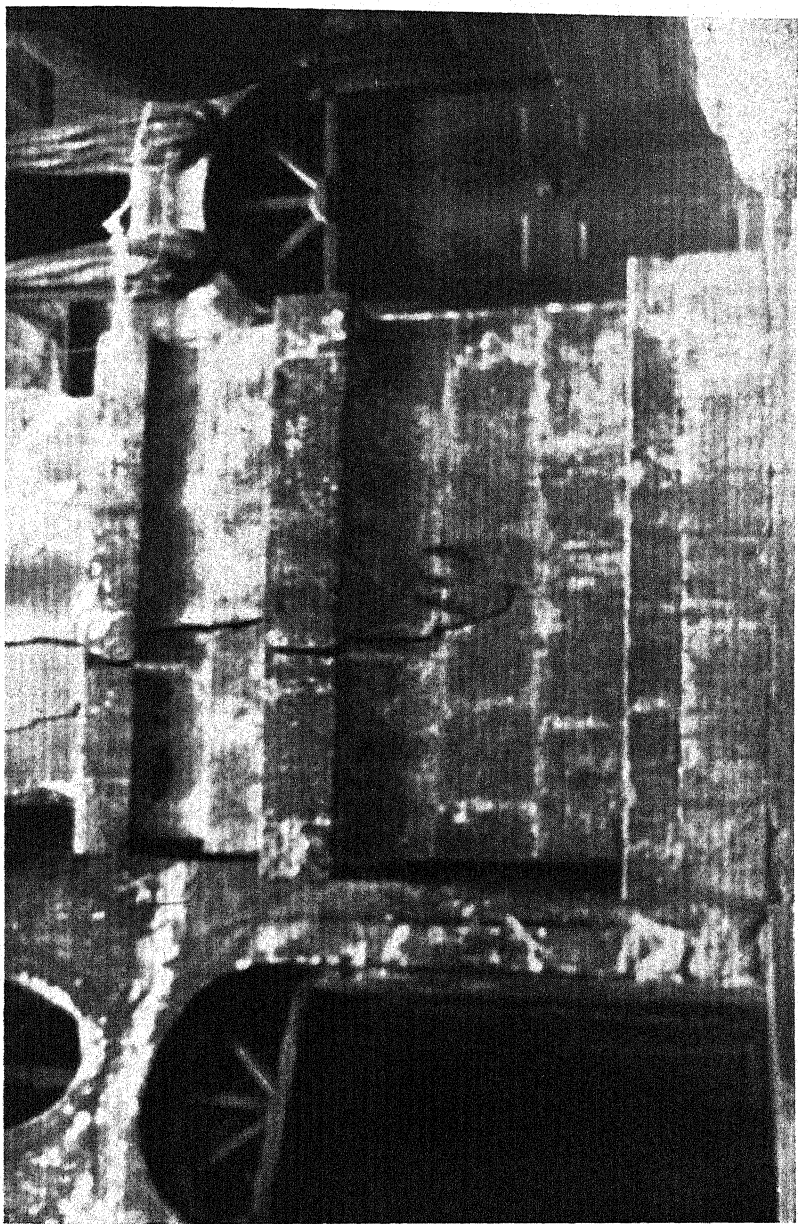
FRACTURED PIER AT W. OF ROTUNDA
